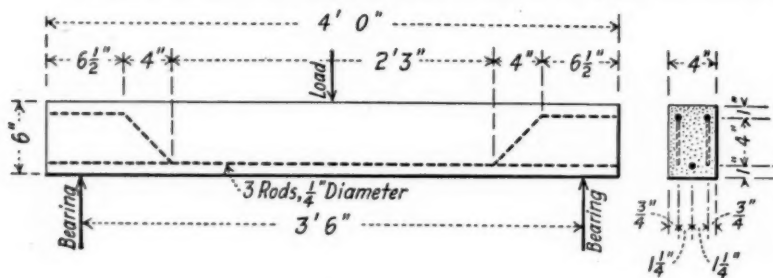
Details of Reinforced-Concrete Beam used in Tests.
